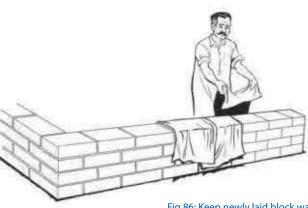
Keep newly laid block walling dampened and shaded throughout the work, to stop the mortar drying out too quickly
